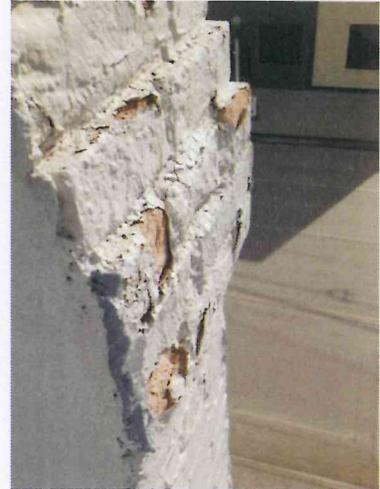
Peeling paint and crumbling brick at the parapet in the southeast corner of the upper roof.
